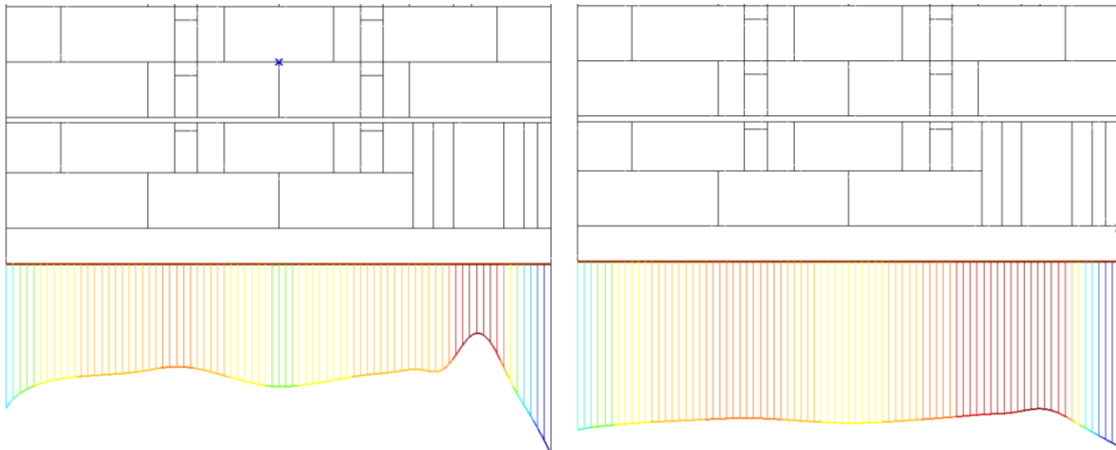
Force distribution as a result of dead load in a 2D precast wall with openings and stiff foundation (left) and actual foundation (right)
